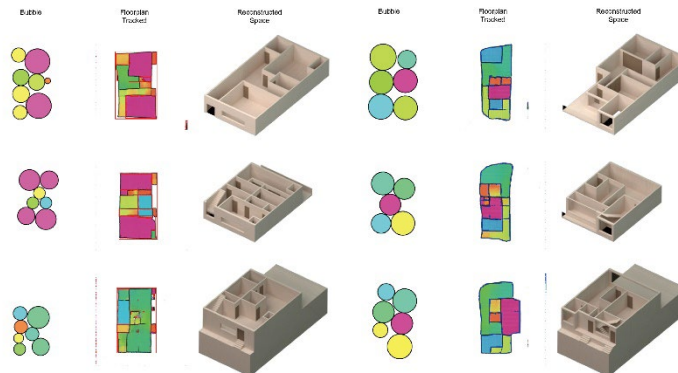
Design Examples of Rowhouse Unit Floor Plans using C-GAN with the Bubble2Floor Dataset
